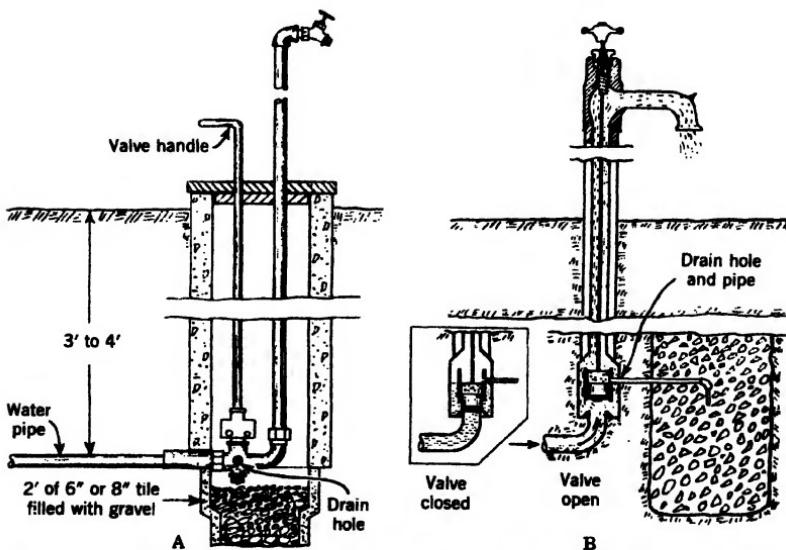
Details of two types of frost-proof yard hydrants. When the valve is closed the water pressure is shut off from the left and the water in the pipe above the valve drains out into the gravel through the drain hole. As the valve is below frost line there is no danger of freezing. The type of valve shown at B is best where the hydrant is used frequently.
